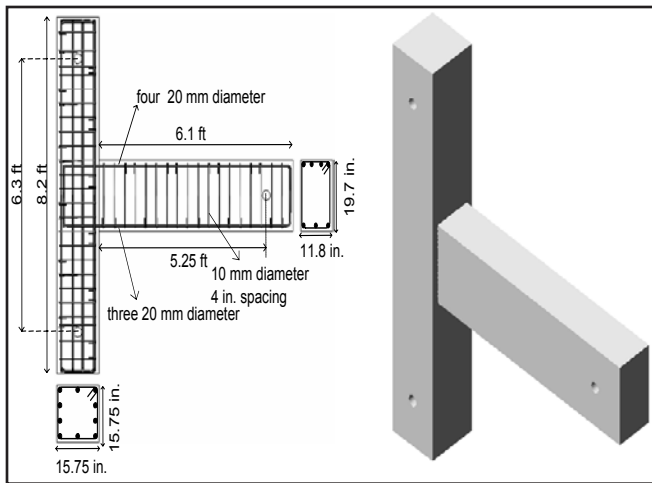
Dimensions and reinforcement detail of monolithic specimen. Note: 1 in. = 25.4 mm; 1 ft = 0.3048 m.
